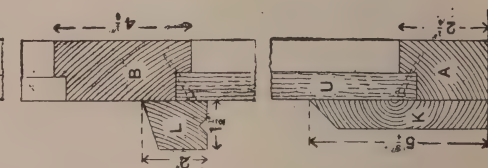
Horizontal Section of Portable Greenhouse through B B (Fig. 3)
